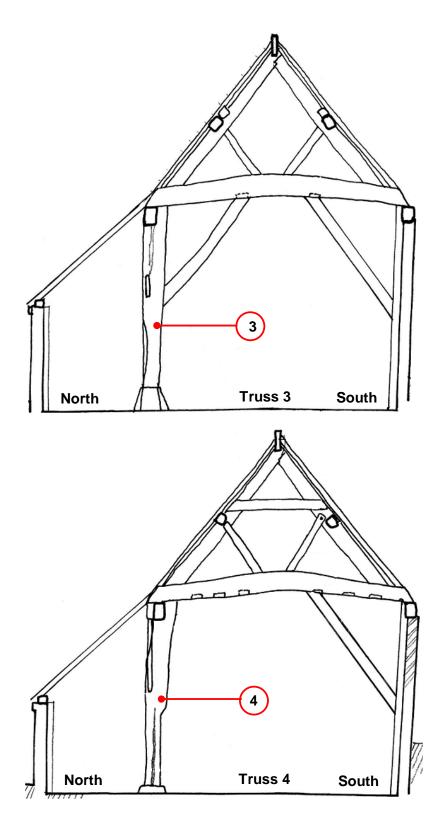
/d: Cross-sections through the barn to show sampled timbers (after Peter Gaze Pace Chartered Architects)
